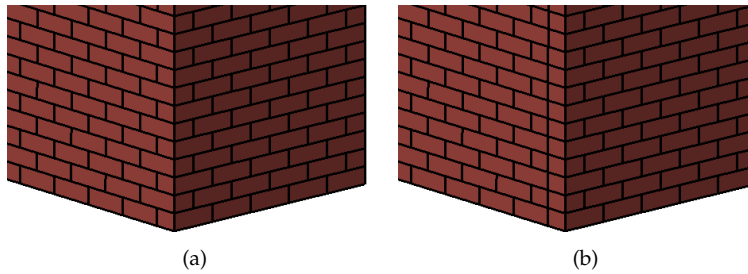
Example of corner between two orthogonal masonry walls (one leaf running bond walls): (a) toothing texture, and (b) without-toothing texture of the corner.
